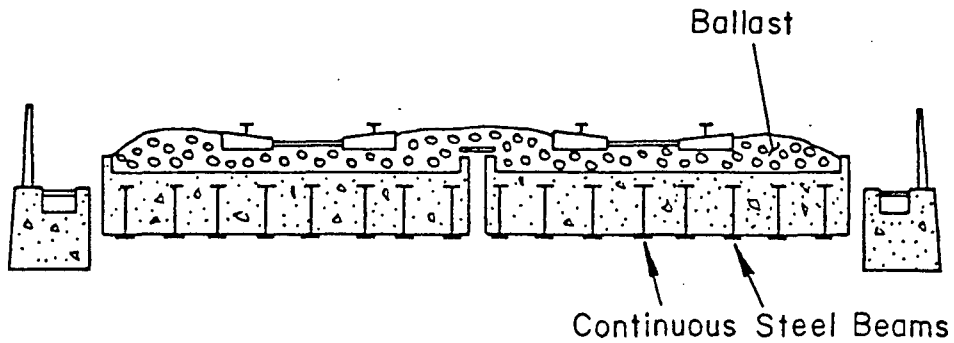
Composite Concrete/Steel Bridge Built by the French National Railways (SNCF)
